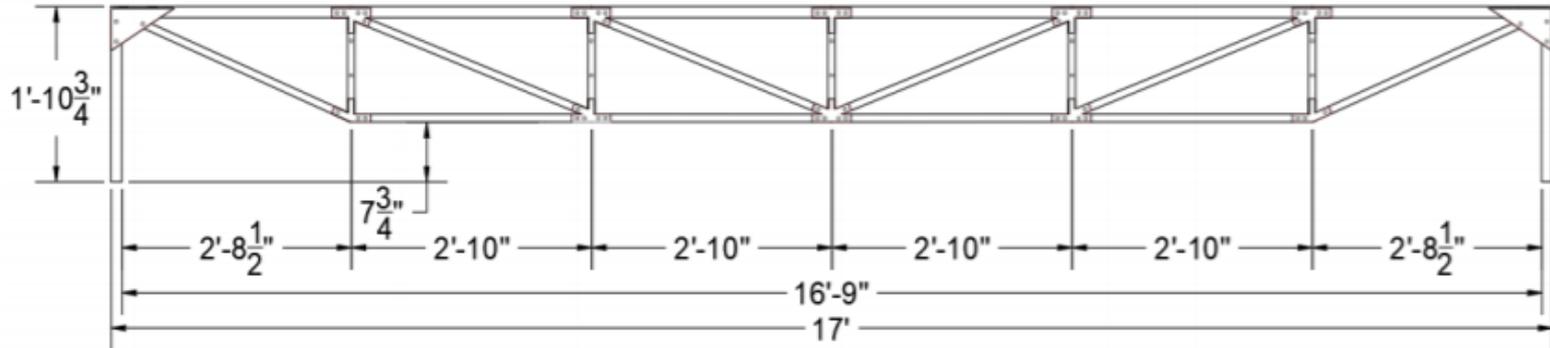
Elevation View from Shop Drawing from 2018 Steel Bridge Team [2]
